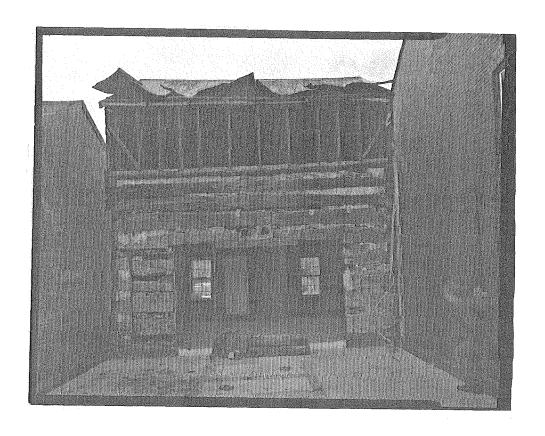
Ice Street, view of east elevation of log tenant house, looking west.
